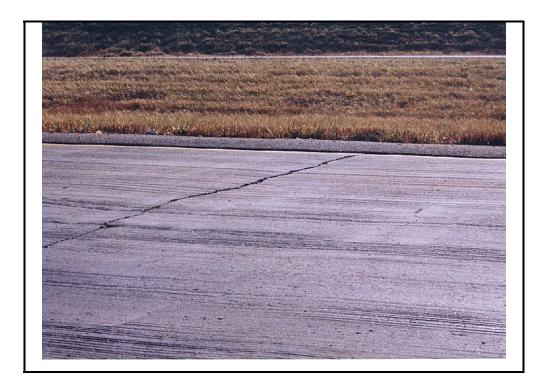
Transverse Cracks in CRC Pavement, Low Severity
